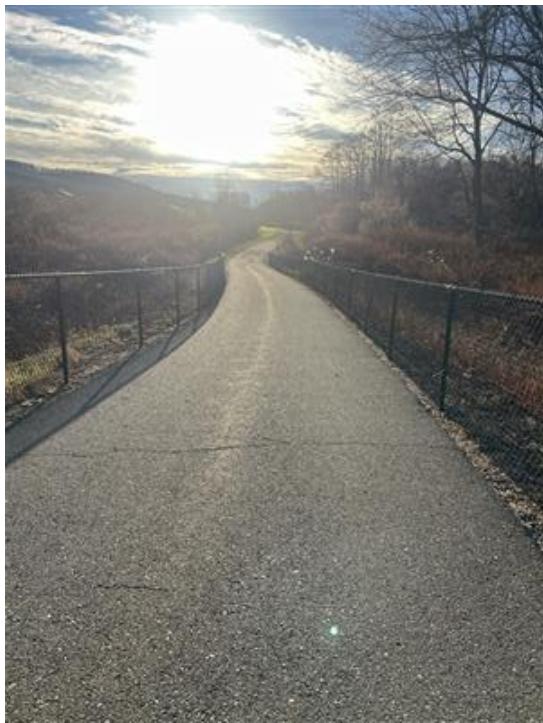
Western View at African Rd Trailhead to Twin Orchard Park
